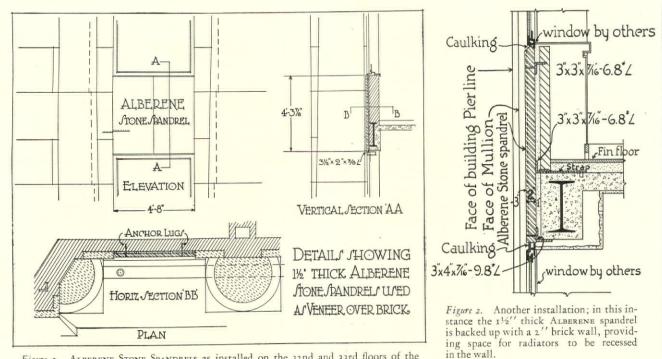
Alberene Stone Spandrels as installed on the 32nd and 33rd floors of the Newark & Essex Bank Building
